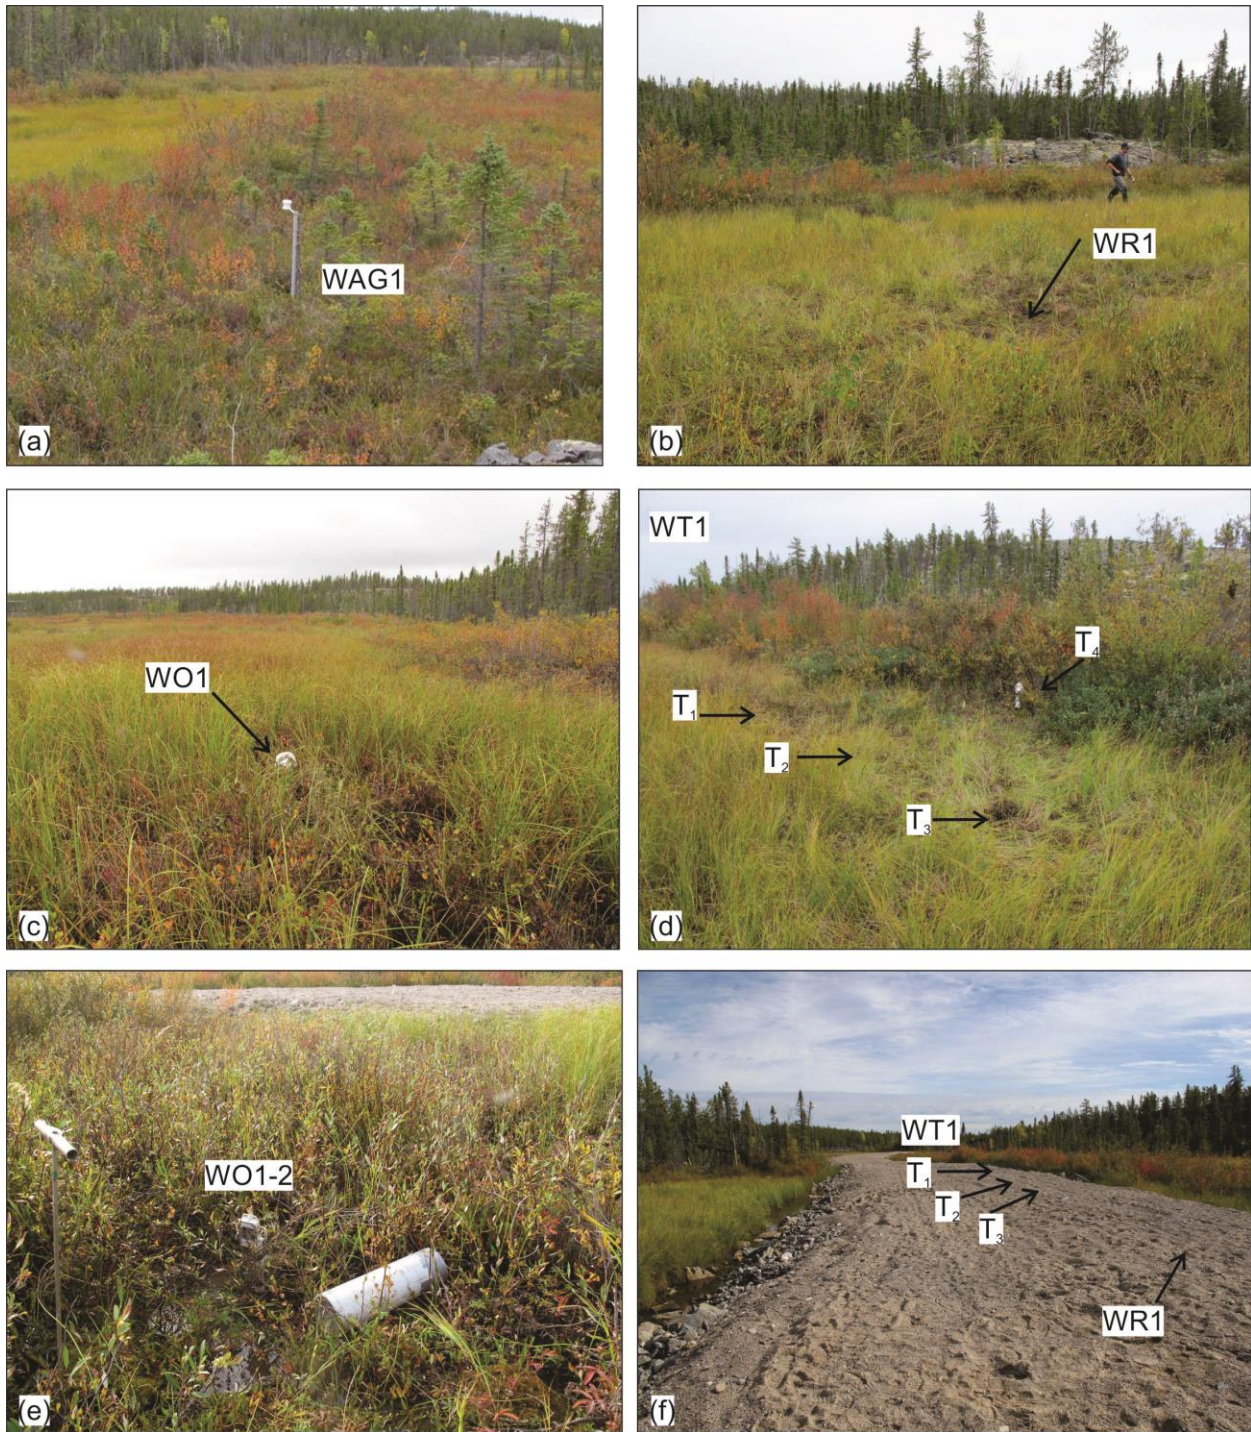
Instrumentation sites at P11: (a) air and ground surface temperature (WAG1); (b) on ROW vertical thermistor string (WR1); (c) off ROW vertical thermistor string (WO1); (d) horizontal transect sensor locations (WT1); and (e) off ROW vertical thermistor string (WO1-2). (f) Shows the surface conditions at WR1 and WT1 ($T_1 - T_3$) after aggregate was placed on ROW. Photos (a – d) were taken in September 2012 and photos (e – f) were taken in September 2013. Road aggregate was added to the ROW in March 2013.
